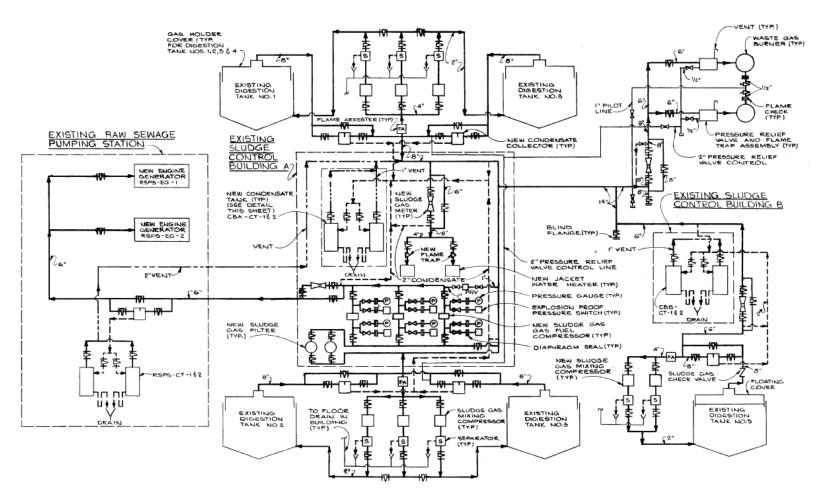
Biogas Piping Schematic (from Plant Record Drawings)
